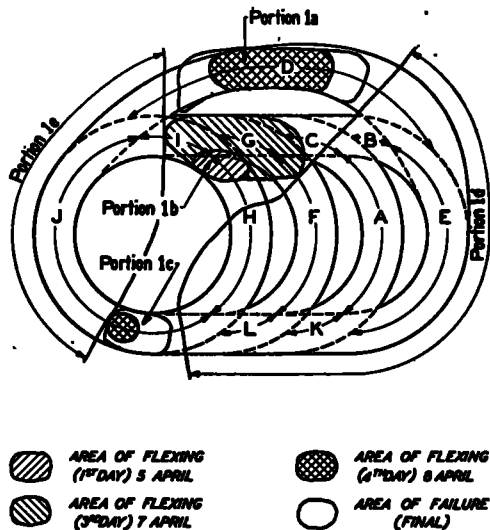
Plan of Test Area I Showing Subdivided Elements and Portions
